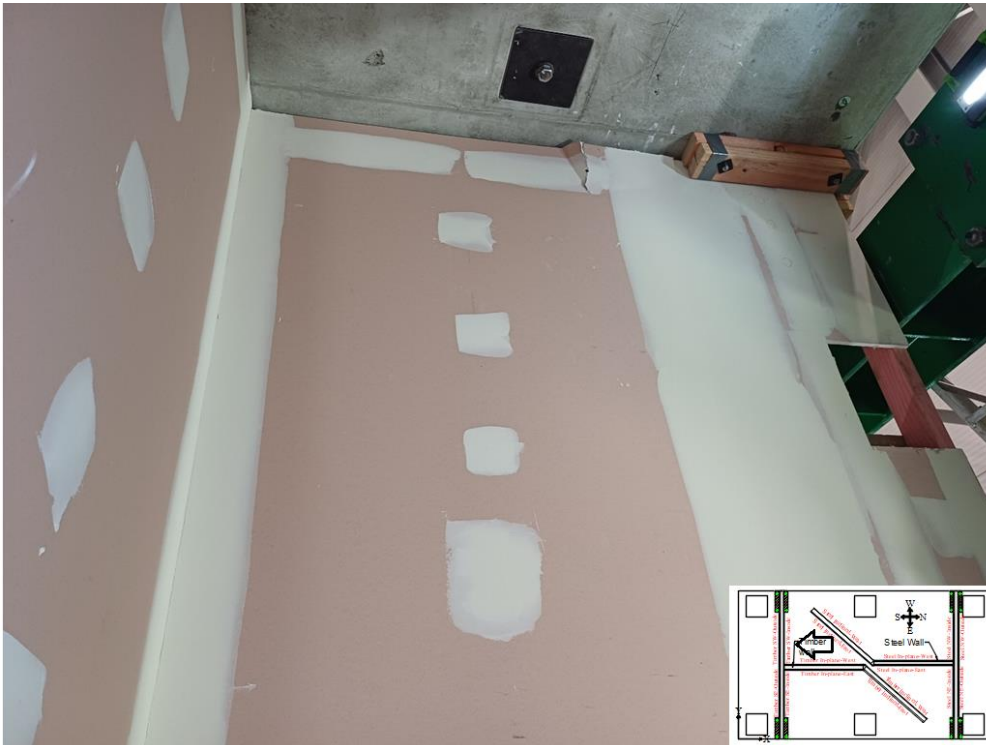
Timber South-West Inside wall after motion 18 - 3 % inter-storey drift
